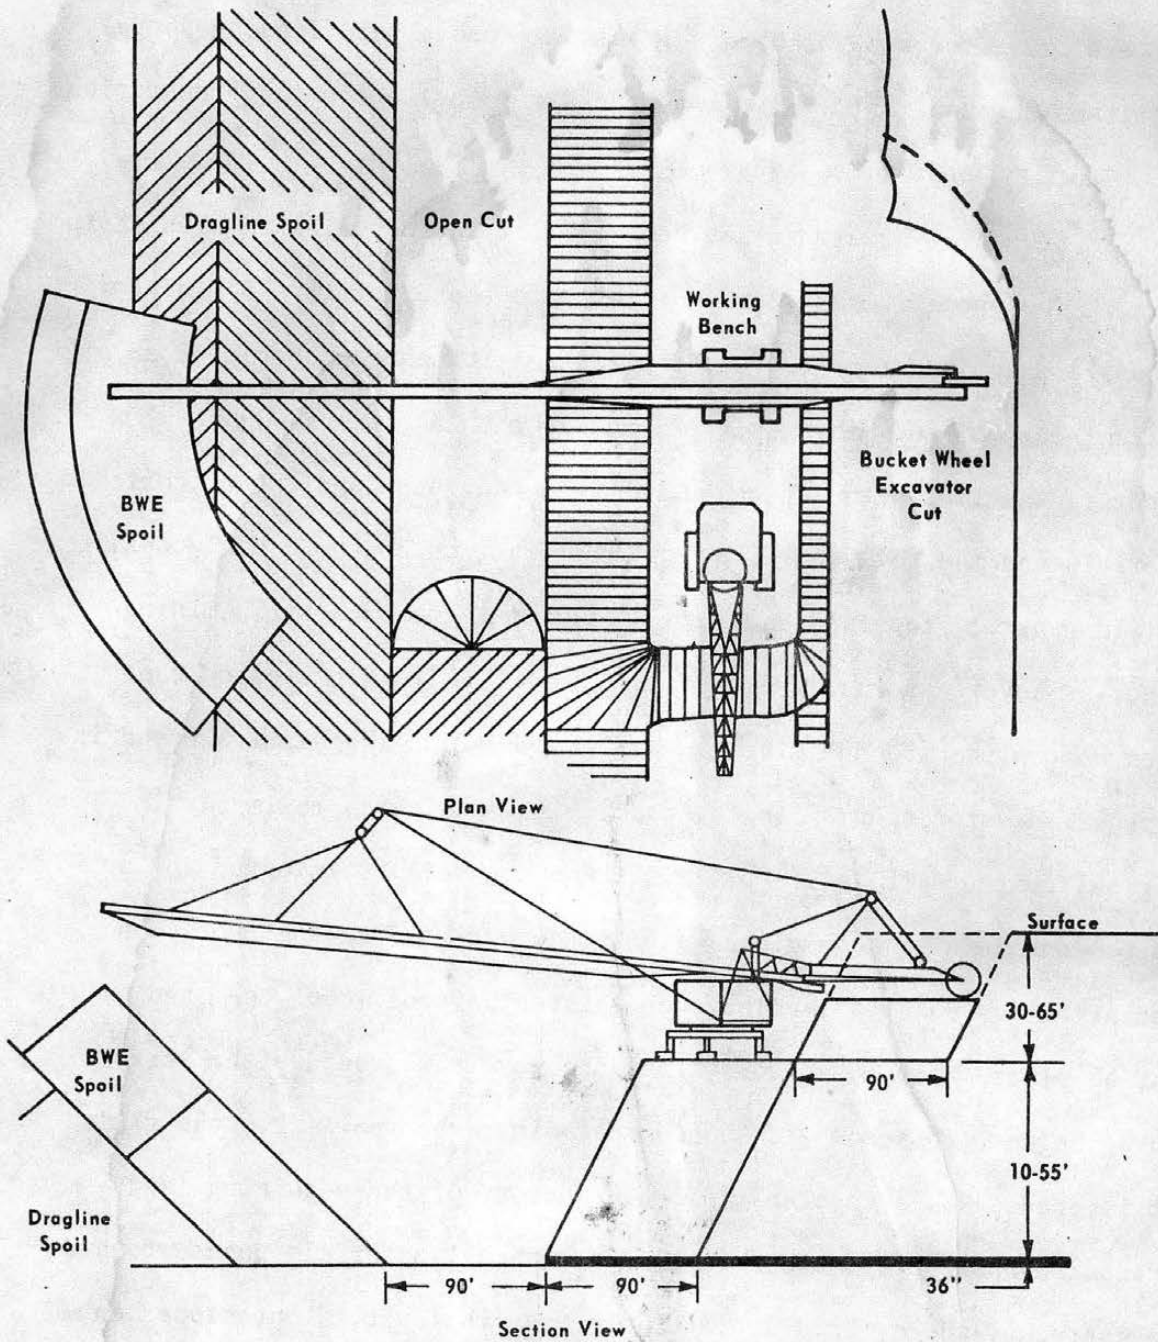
Plan and section views of a dragline and bucket wheel excavator in tandem operation, [2].
